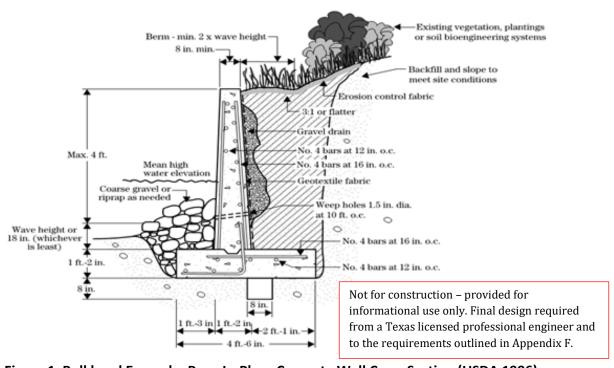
Bulkhead Example, Pour-In-Place Concrete Wall Cross Section (USDA 1996)
